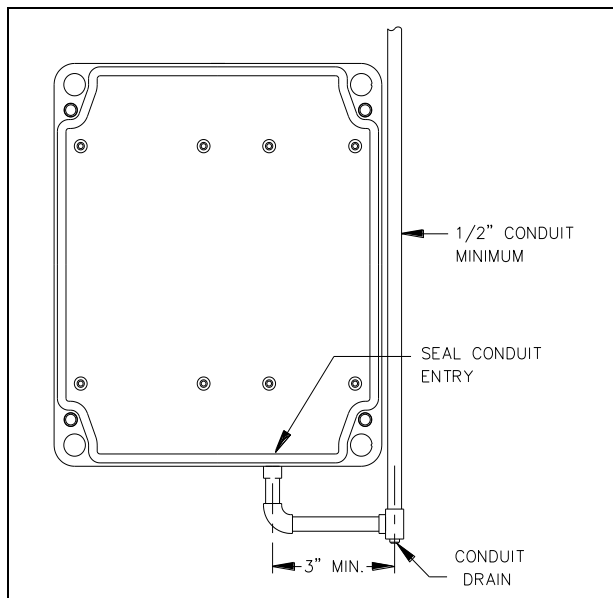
Model 247-710 & 257-710—Bottom entry conduit installation details
